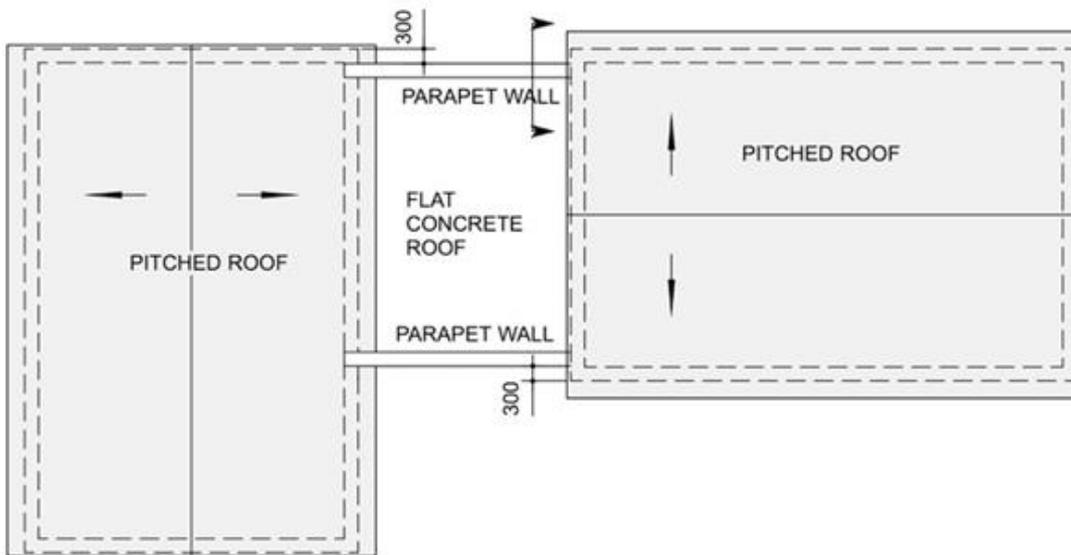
Plan detail of typical flat roof situated to the side of a pitched roof and abutting a gable.
